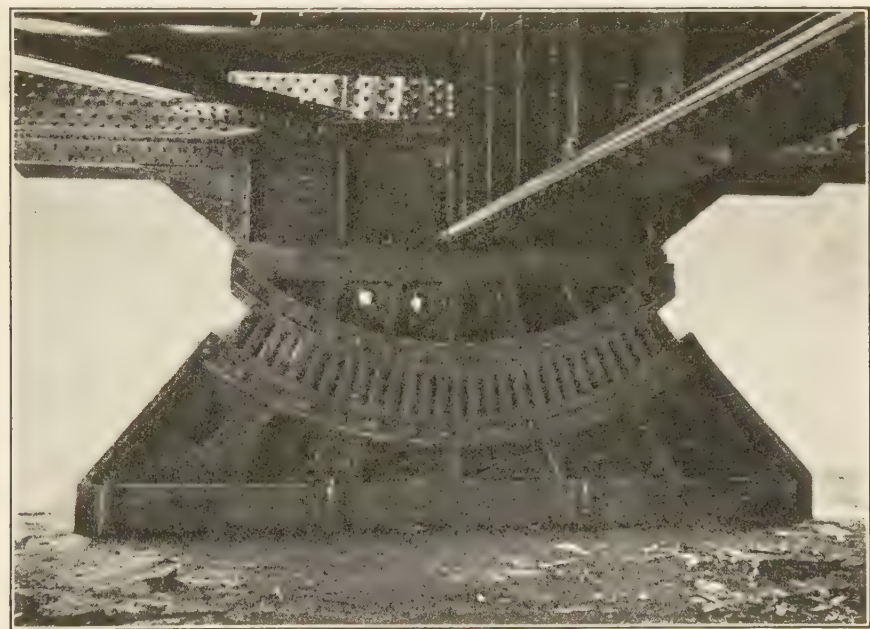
A.—Tower pier bearing, Beaver Bridge.
